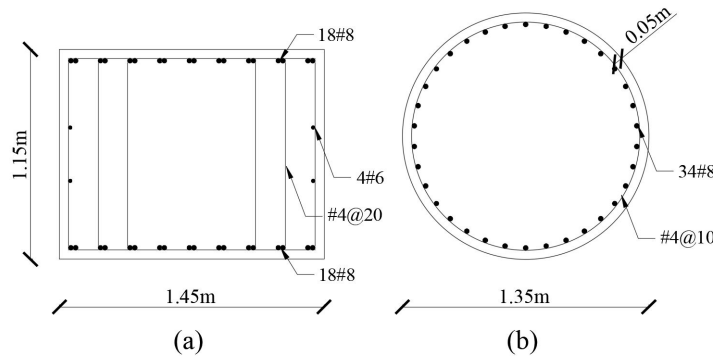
Geometric section and steel reinforcement (a) beam caps (b) columns
